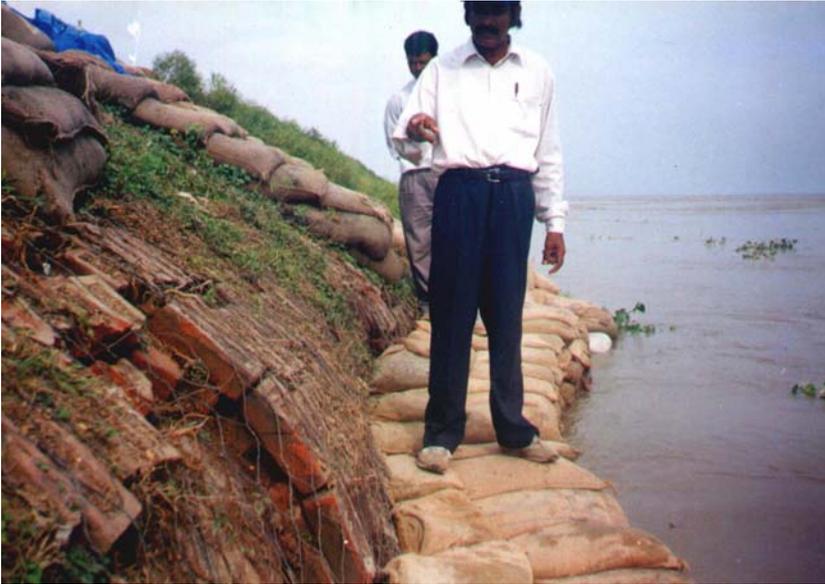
Photograph showing dumped sand bags and brick crates on the embankment slope
